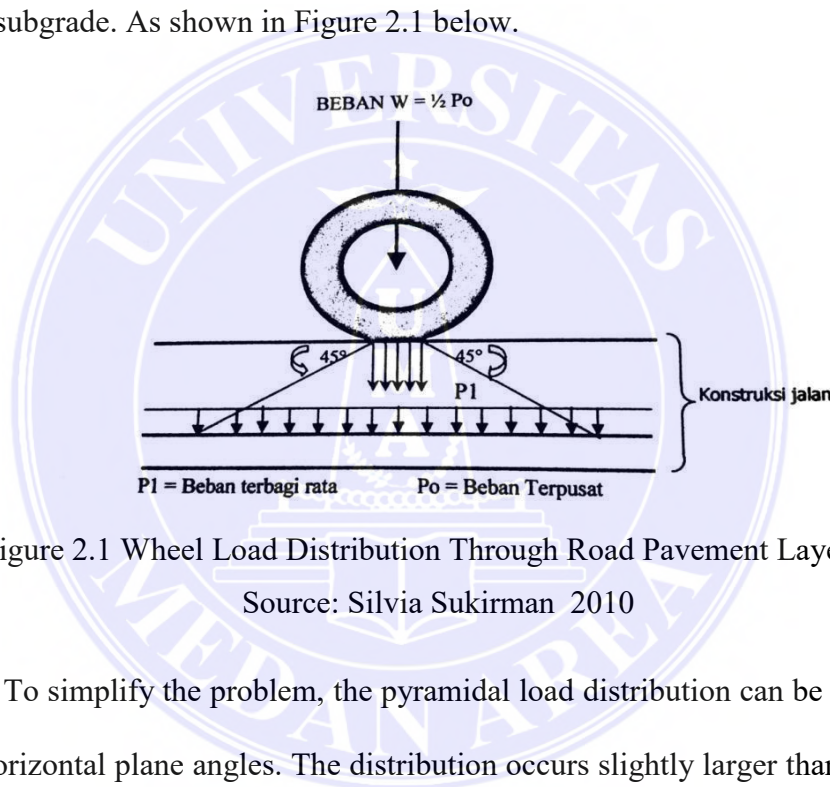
Wheel Load Distribution Through Road Pavement Layer
